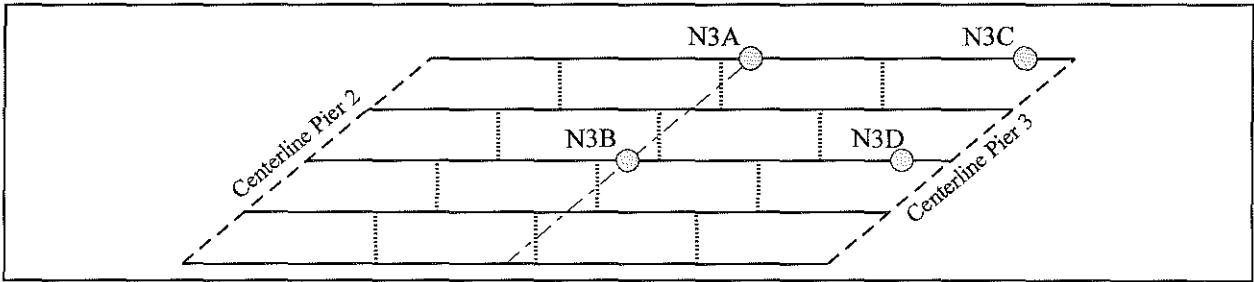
Girder Strain Gage Locations in the Northbound Bridge (Bridge Without Intermediate Diaphragms).
